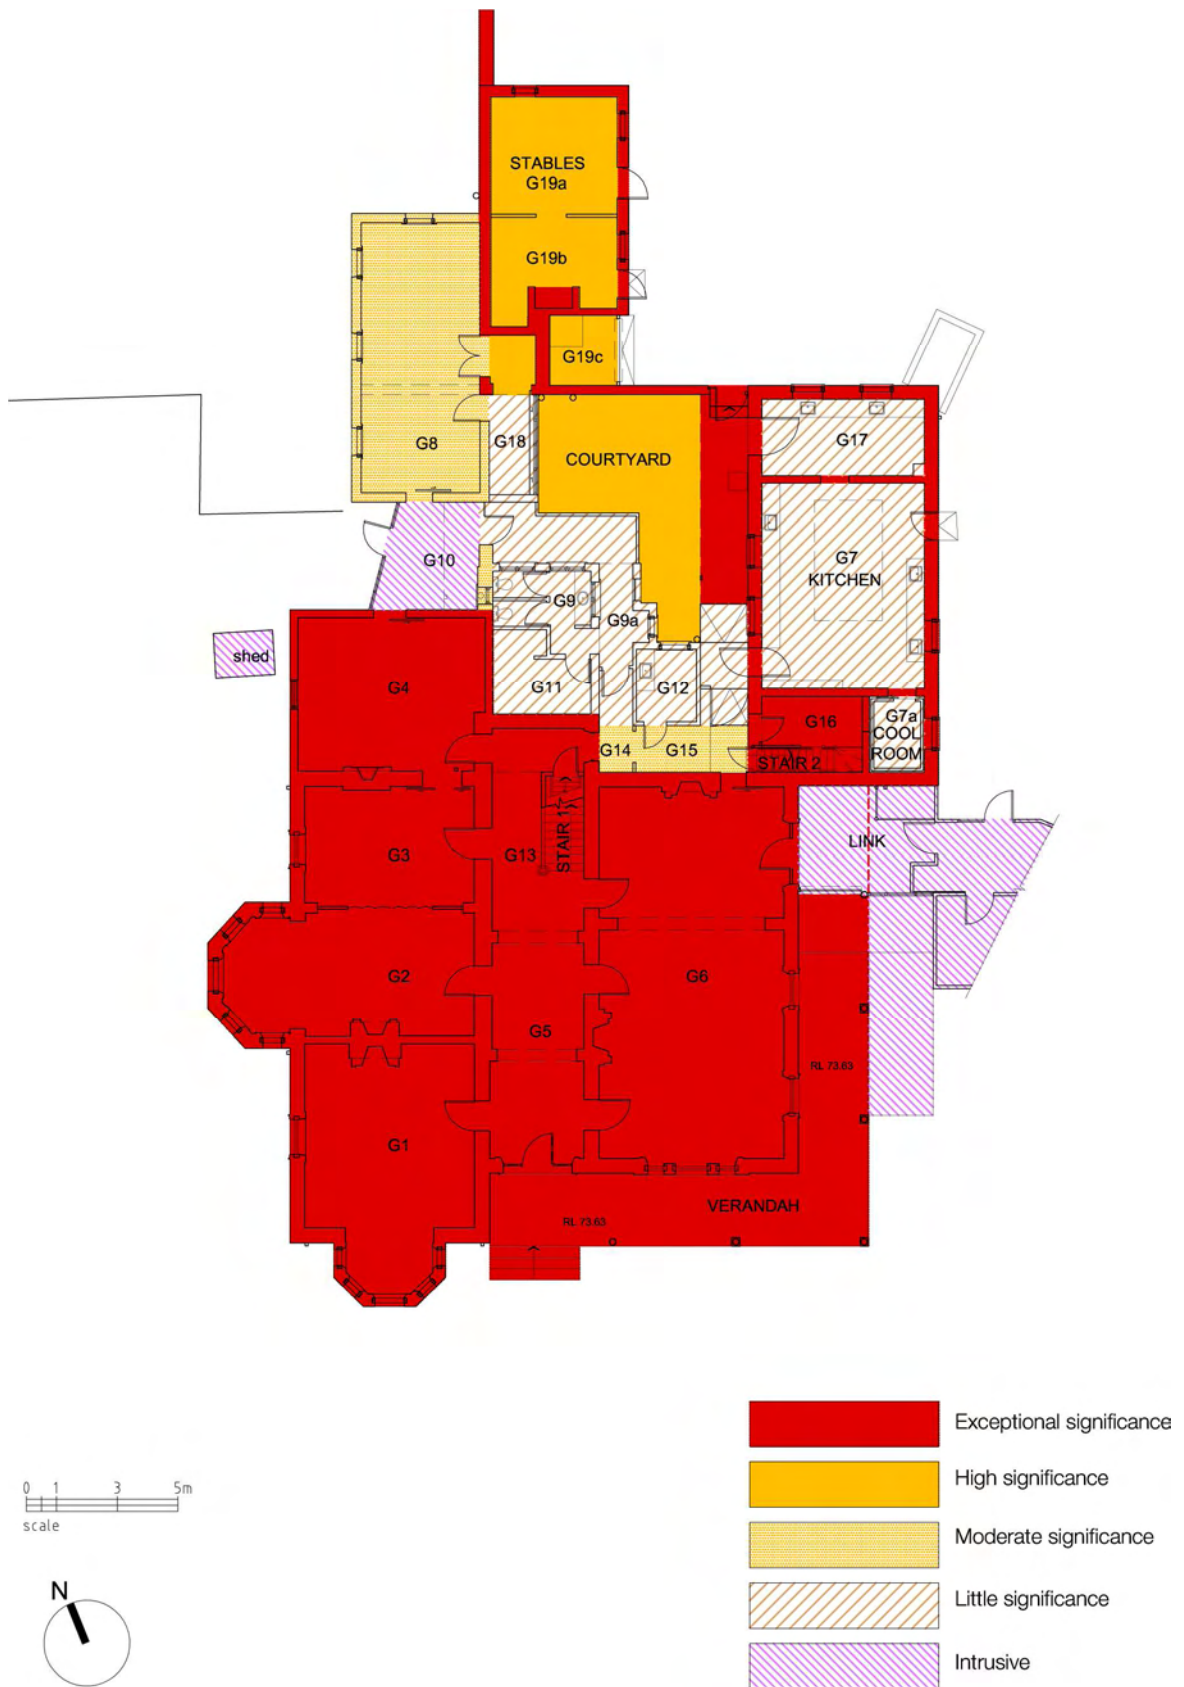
Ground floor plan of Graythwaite House, levels of significance. Not to scale.
